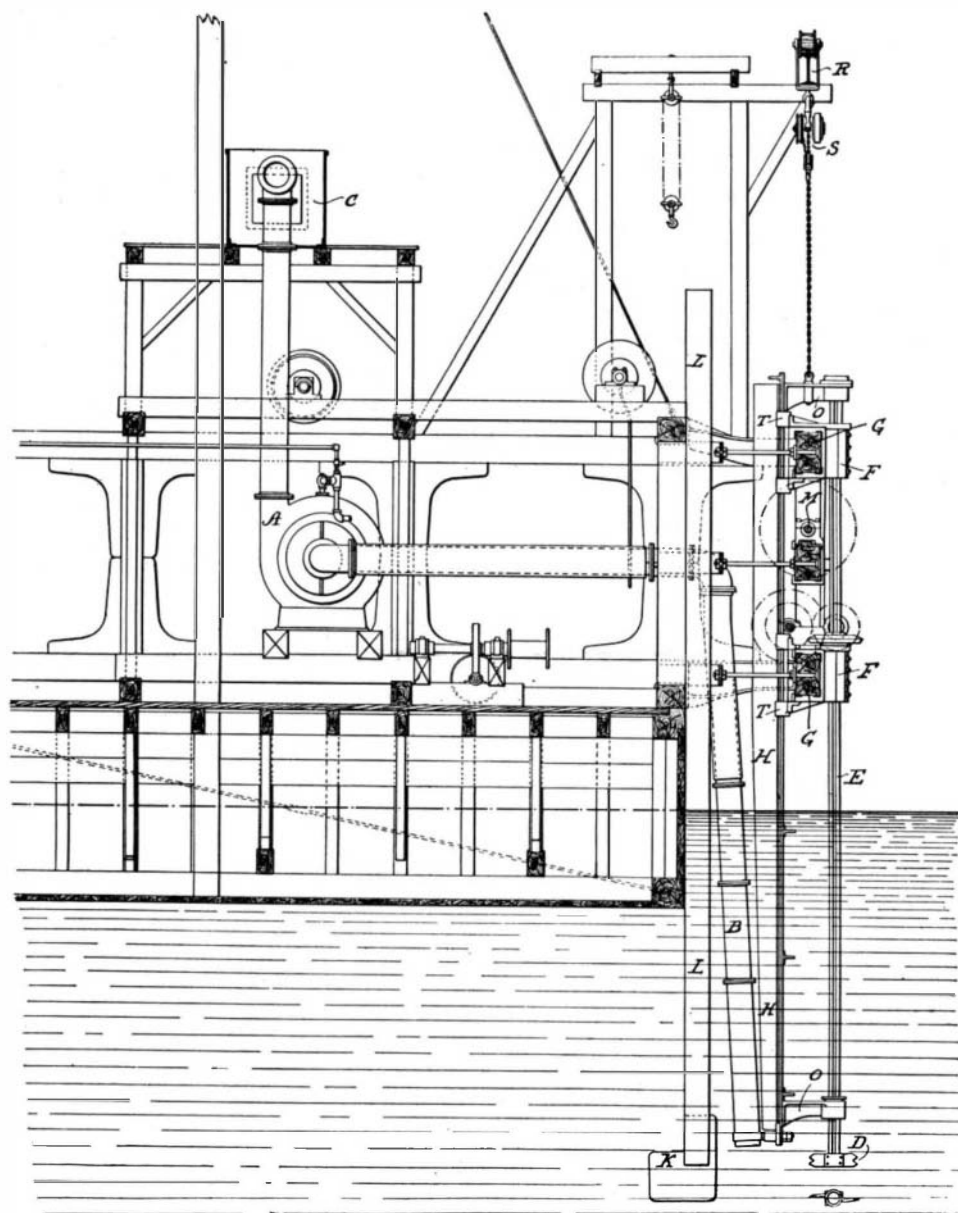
SECTION THROUGH FRONT END OF HYDRAULIC DREDGE.
